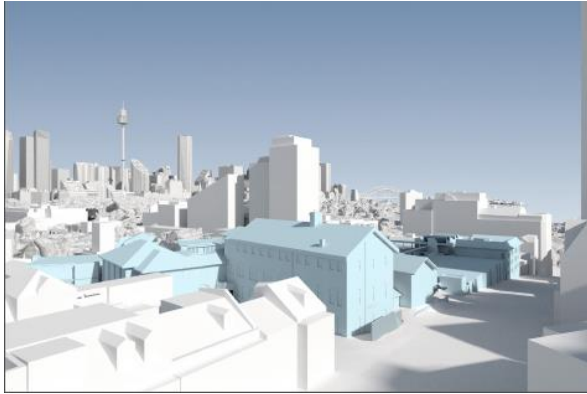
Proposed massing for new administration building, restored Barham House and new multi-purpose building
